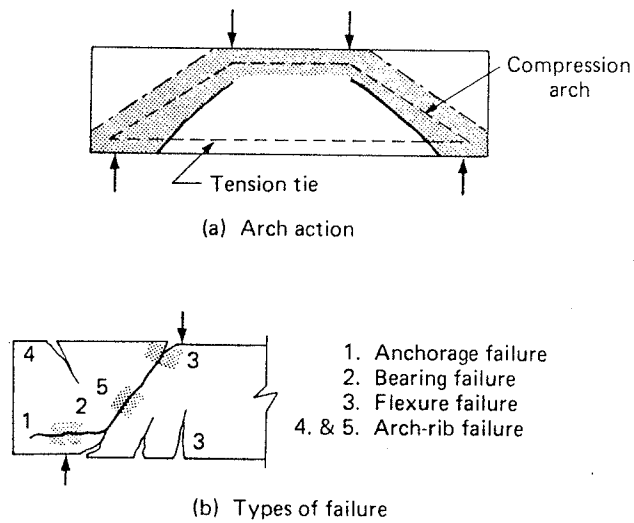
MODES OF FAILURE IN DEEP BEAMS
